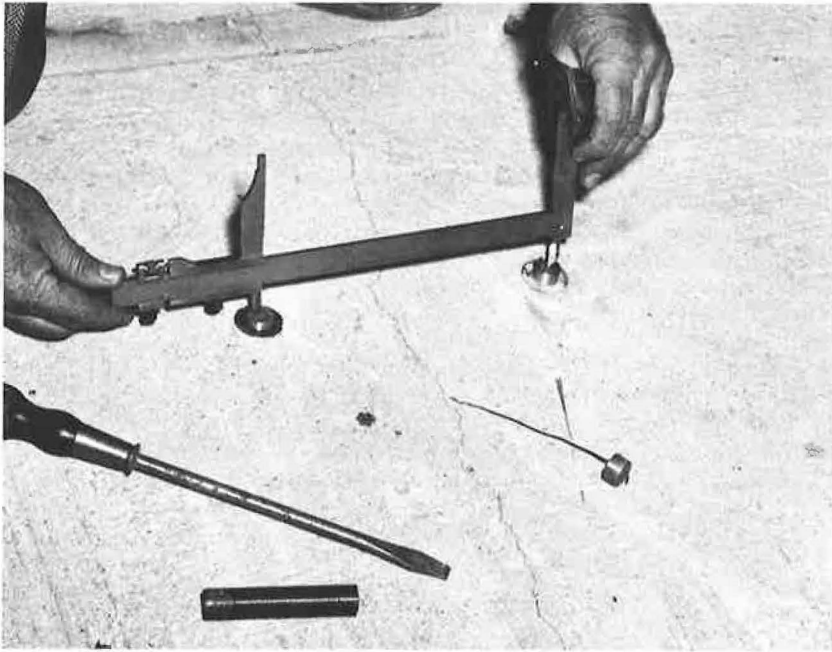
Width of induced crack being measured at brass plug gage points with vernier calipers.
